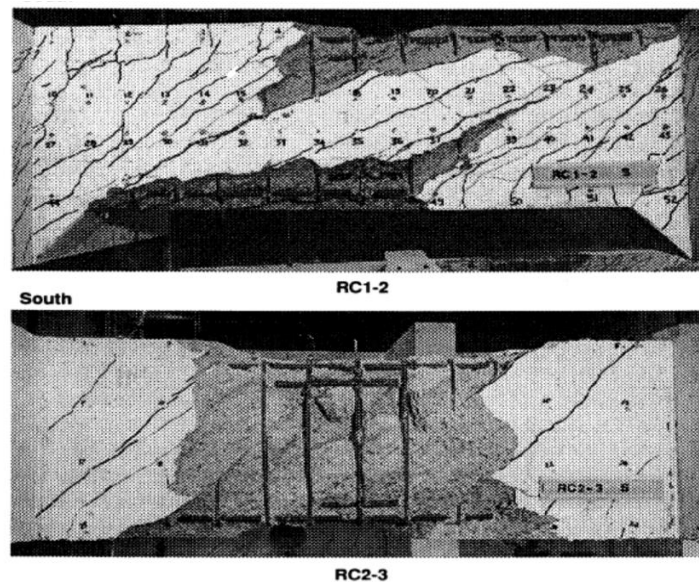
1995, Rahal KN, Collins MP. Observed Spalling on south and north faces of Specimen RC1-2 and RC2-3
